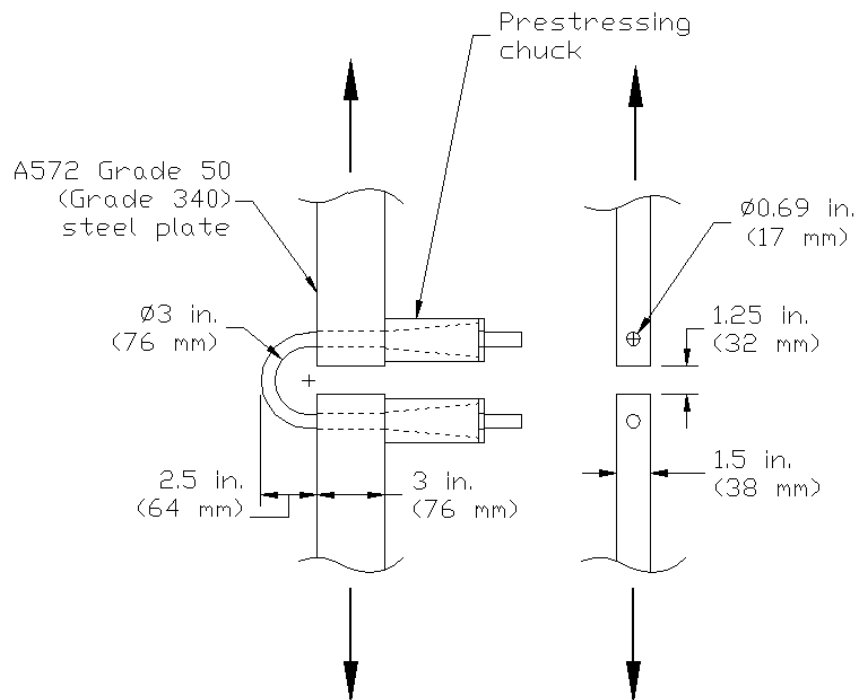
Plan and elevation of 3 in. (76 mm) diameter hook specimen test setup
